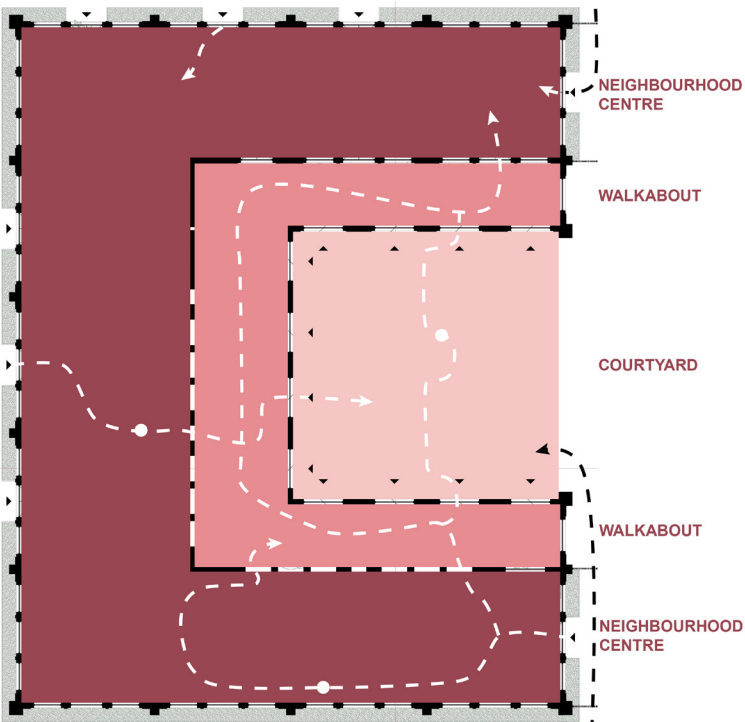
Zoning magnolia (rings) (floorplan, scale ~1:100)
